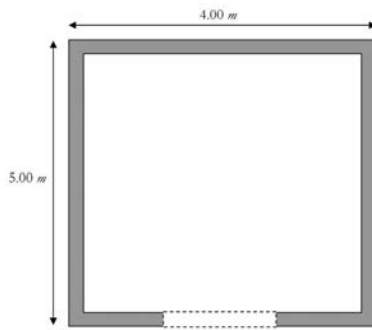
Typical plan shape (of ground floor) of a single-unit building.
